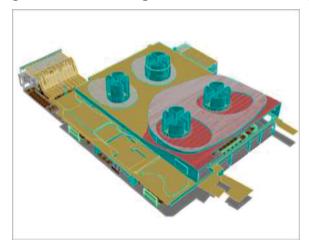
Food Court 3D plan with Column and Special Features, Mall of Oman (AutoCAD)
